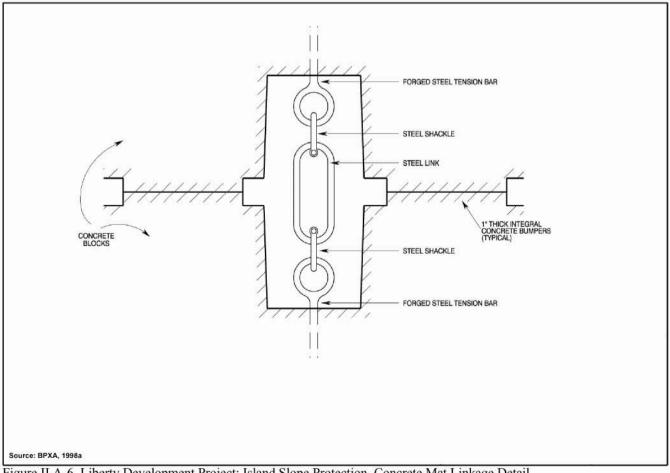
Liberty Development Project: Island Slope Protection, Concrete Mat Linkage Detail
